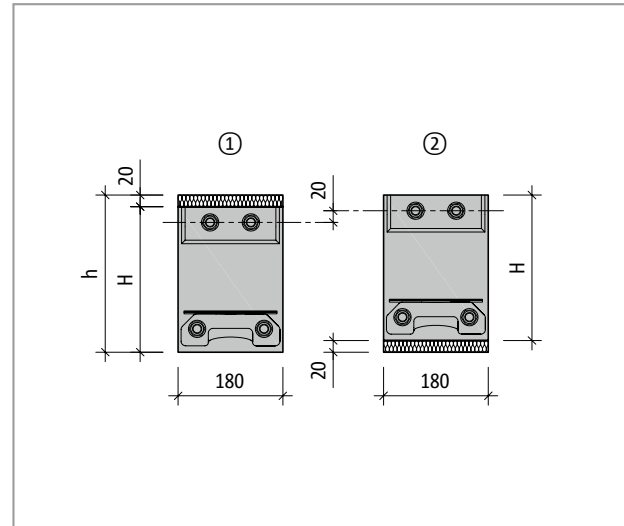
Schöck Isokorb® T type SK: Layout with offset heights
